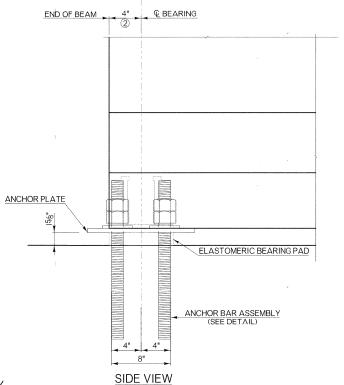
## DETAILS OF STAINLESS STEEL BEARING ASSEMBLY
